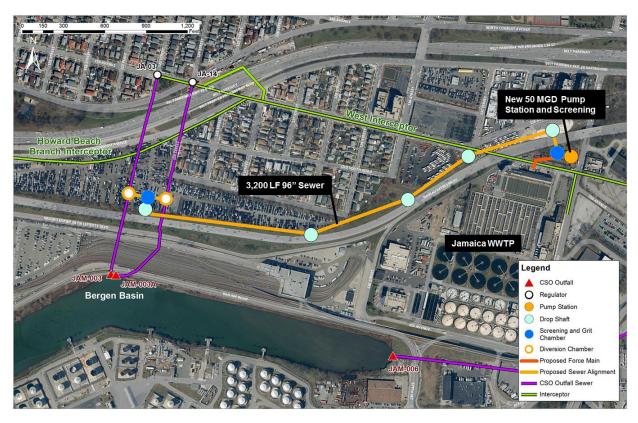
Layout of Proposed Parallel Sewer to West Interceptor and Dewatering Pumping Station
